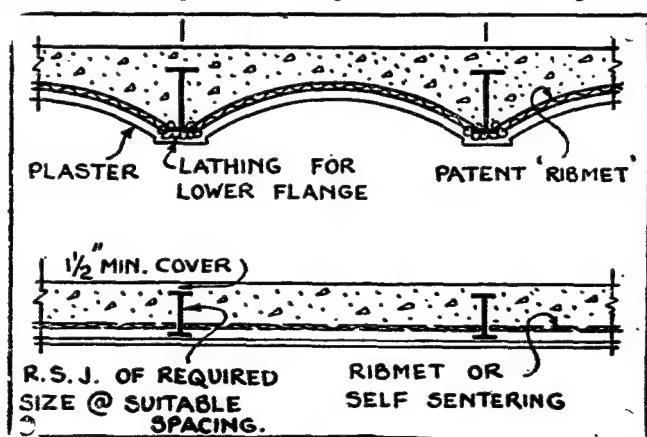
, Expanded metal rib-mesh floors—Jack arch type
